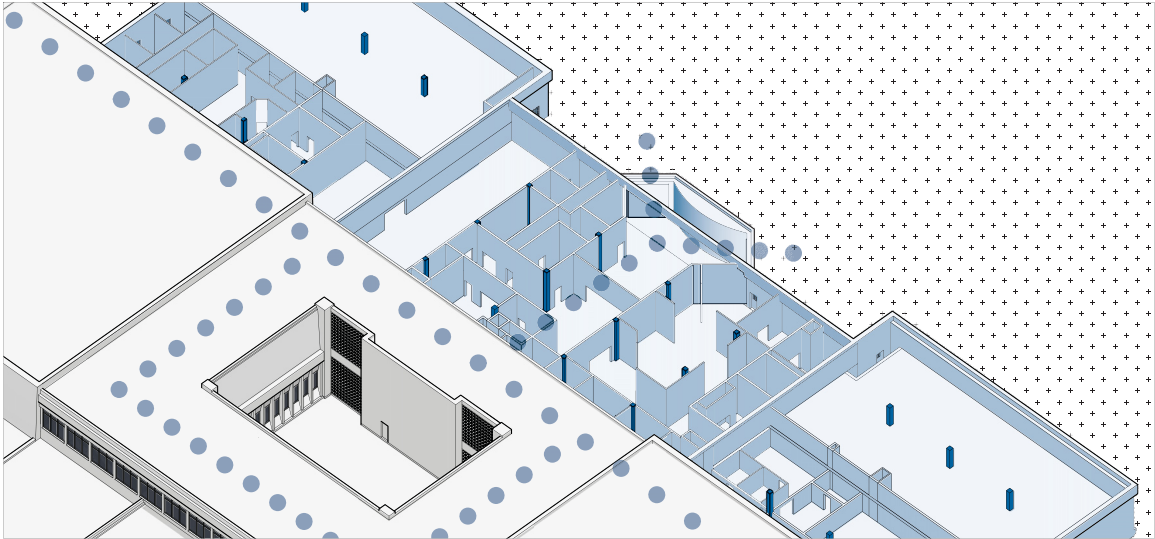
Laboratories and Storage (4123 m²) walls stripped to structure to allow new public North entry
